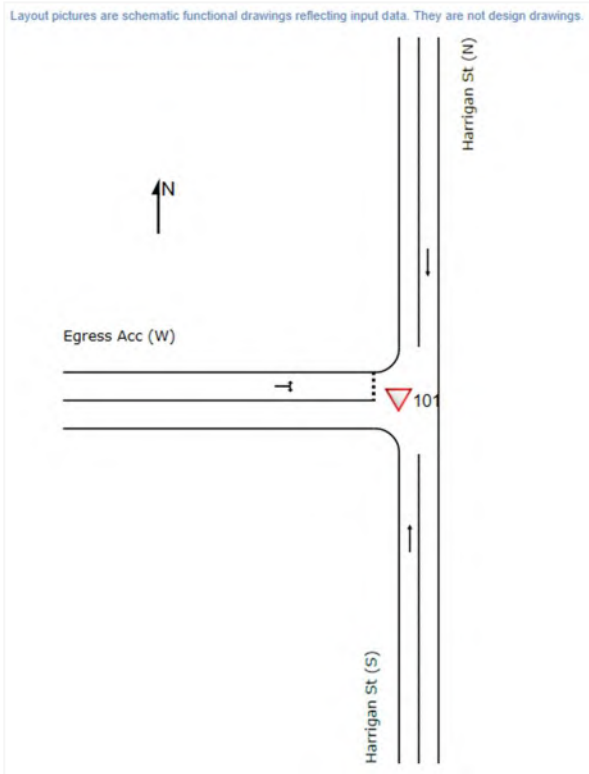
Proposed Harrigan Street/Access Driveway 1 (Egress-Only Access)
